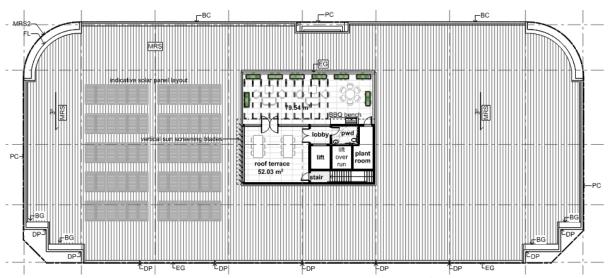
Roof Plan. Source: Sparc - Issue J dated 05/03/24
